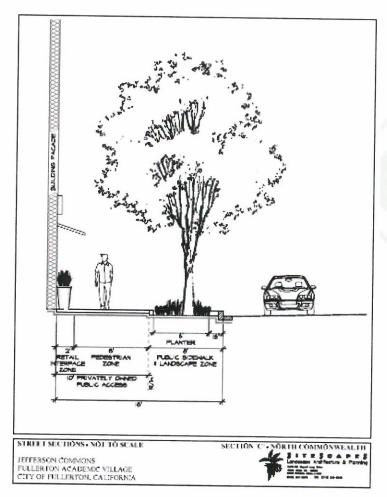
Conceptual Landscape Cross-Section: Commonwealth Avenue
